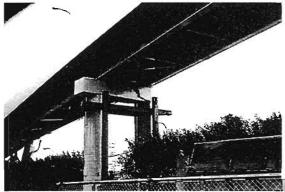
Ramp onto Hanshin Expressway, Kobe: Sideways shift of deck and brittle fracture of portal frame crosshead beam
